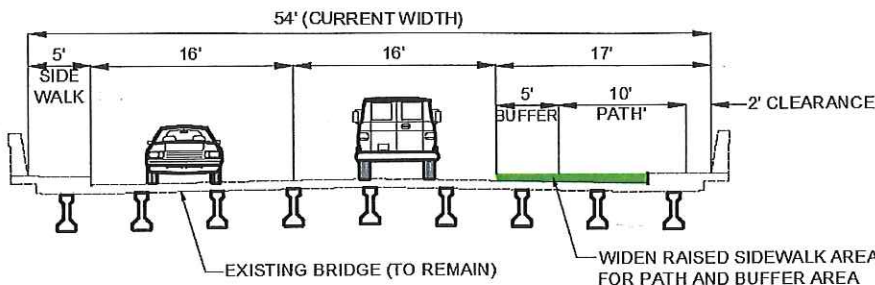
EXHIBIT C – CONCEPTUAL BRIDGE TYPICAL SECTION
